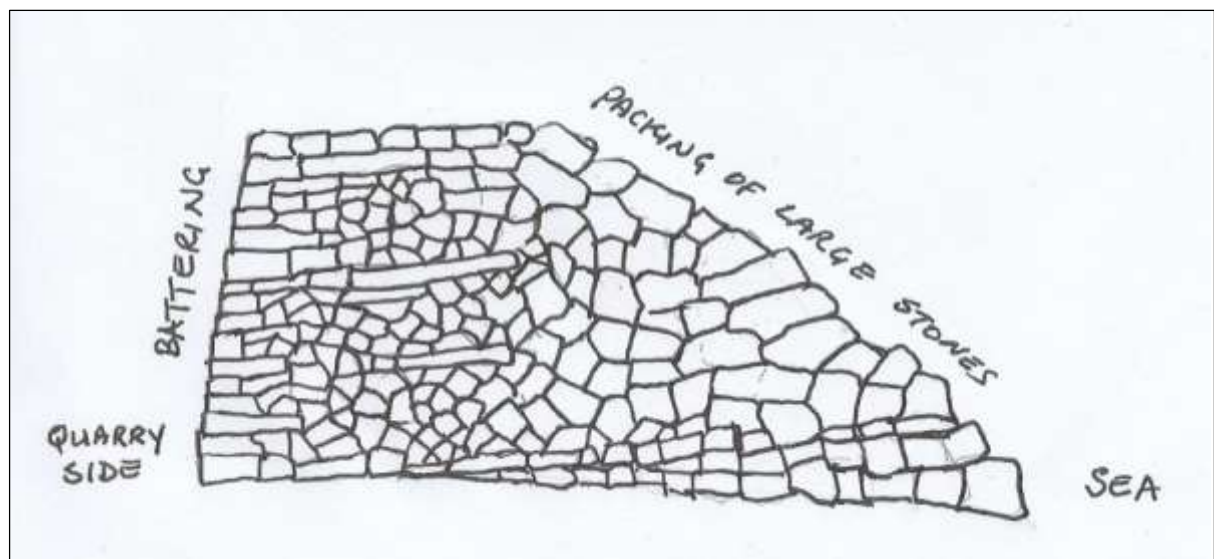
Cross-sectional drawing shows the proposed structural design of the wall with (i) carefully stacked stones that makes the façade facing the quarry, (ii) core of the wall with occasional transversely laid tie stones (iii) defensive skin of the wall with the size of blocks laid increasing from the centre of the wall towards the sea façade.
